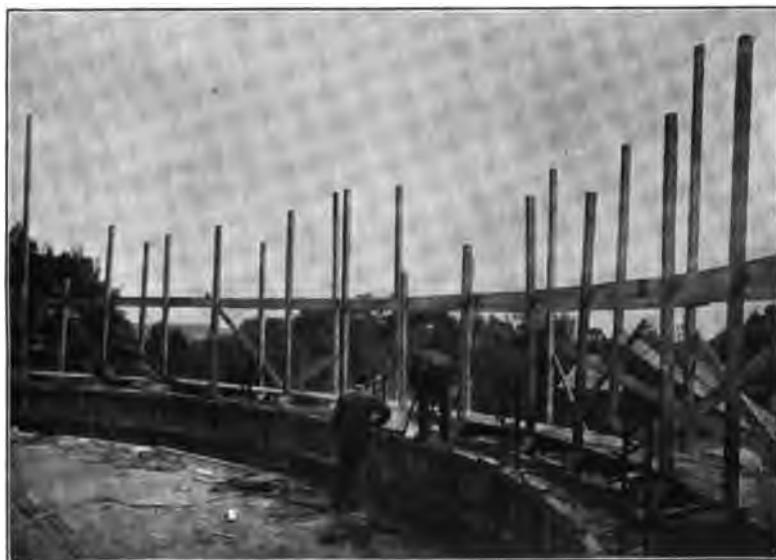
LOWER PART OF WALL, WITH SUPPORTS FOR REINFORCEMENT RINGS.
